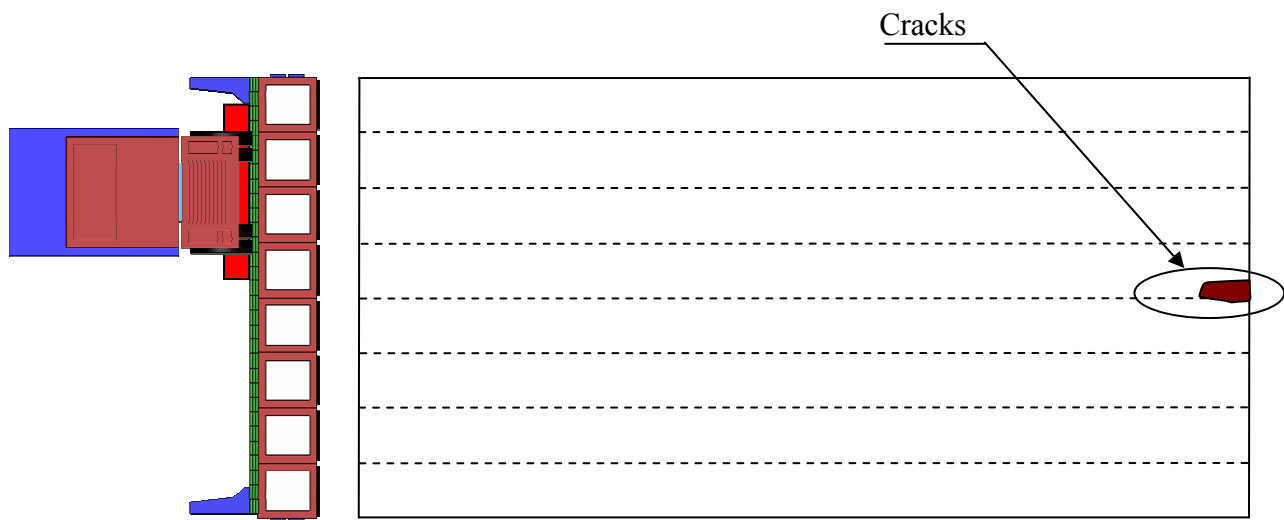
Crack development in the slab bottom surface after applying AASHTO HL-93 load.
